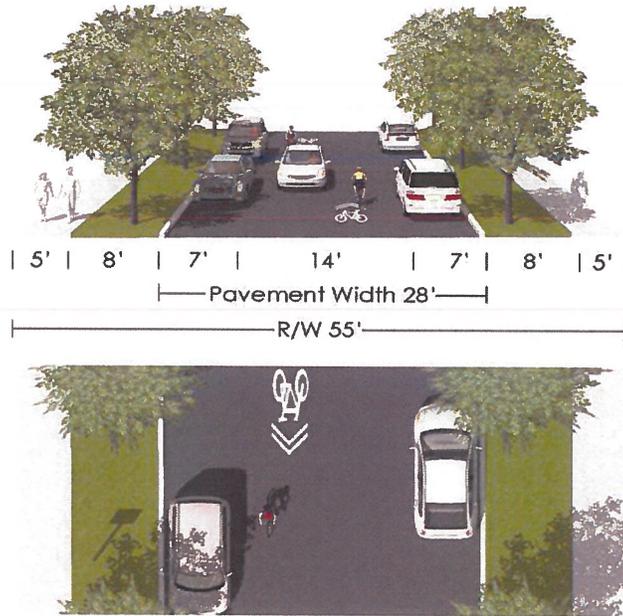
Minor Residential Street – Neighborhood Bikeway
